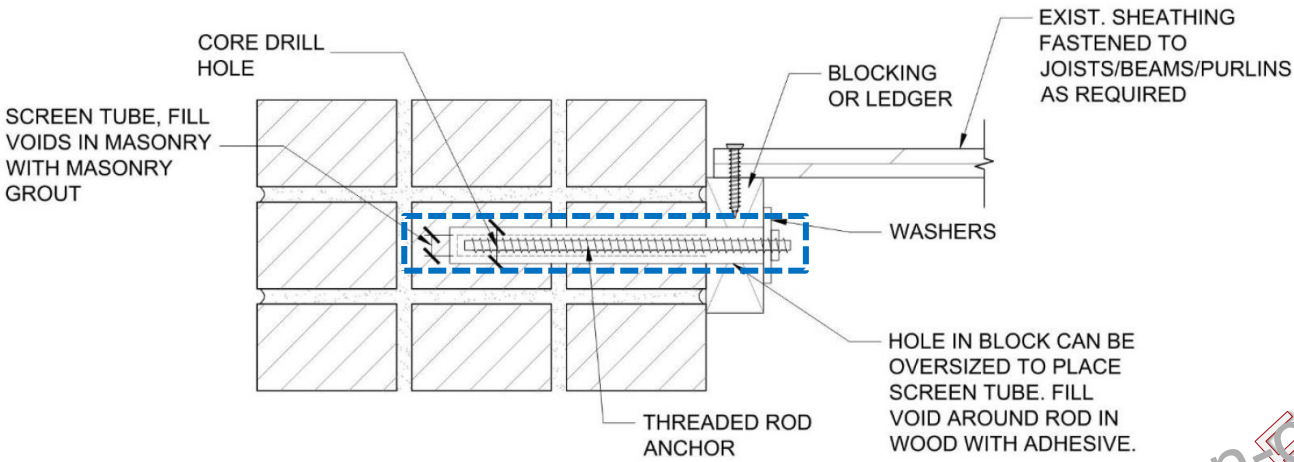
Drilled dowel connecting wood diaphragm to URM wall
